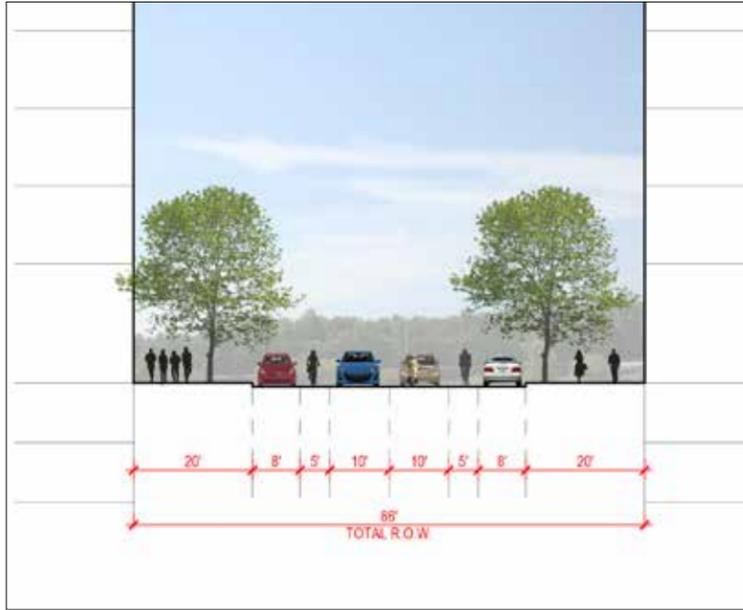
Cross section through typical "B" street with bike lanes
